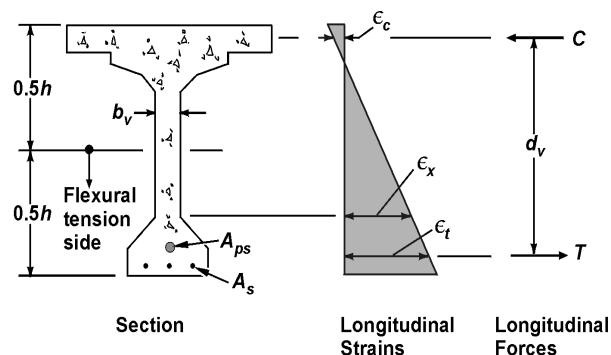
Longitudinal Strain, ϵ_x , for Sections Containing Less than the Minimum Amount of Transverse Reinforcement
